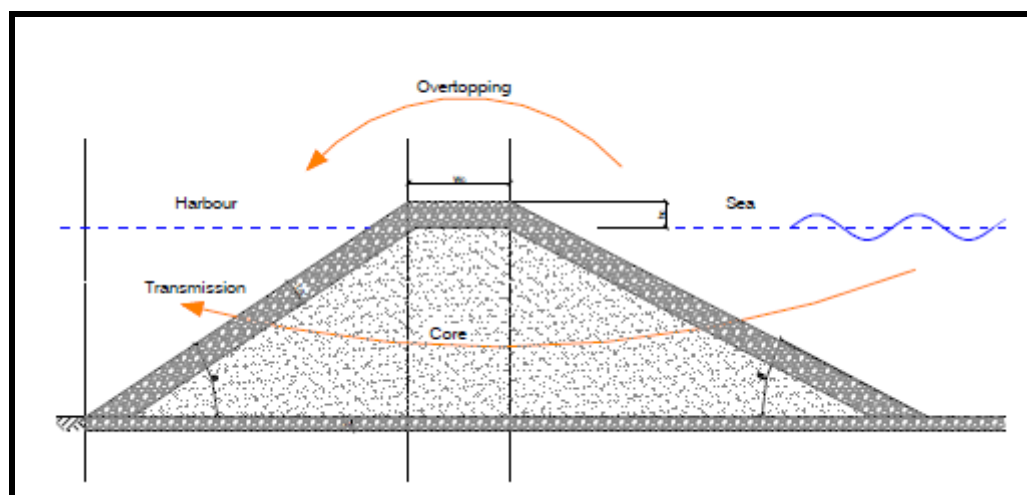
Typical cross section of rubble mound breakwater (Fousert, 2006)
